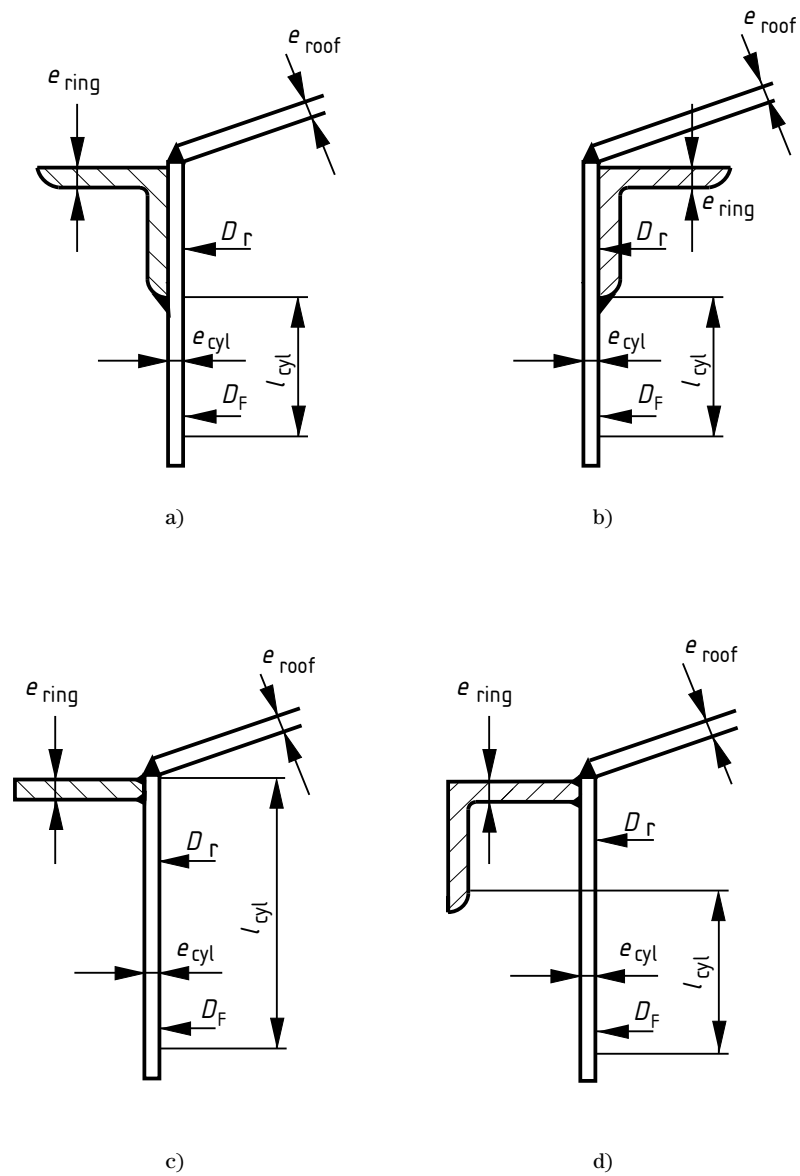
Roof to upper course junctions: roof welded to the upper course
